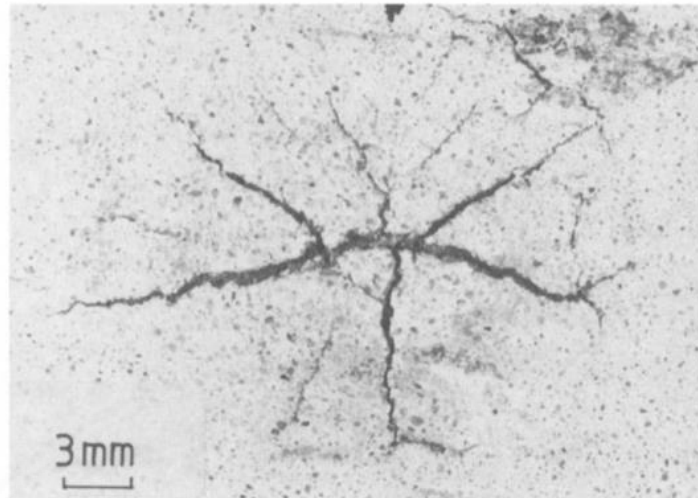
A concrete slab showing blistering due to iron sulfide deterioration (Shayan, 1988)
